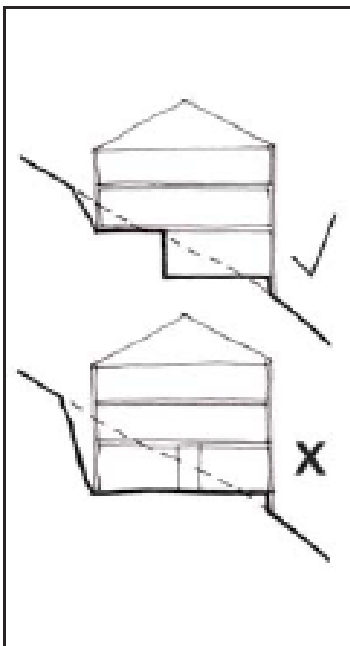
Habitable rooms are to have at least one external wall fully above existing ground level to minimise cut and fill and to encourage good quality internal environments.
